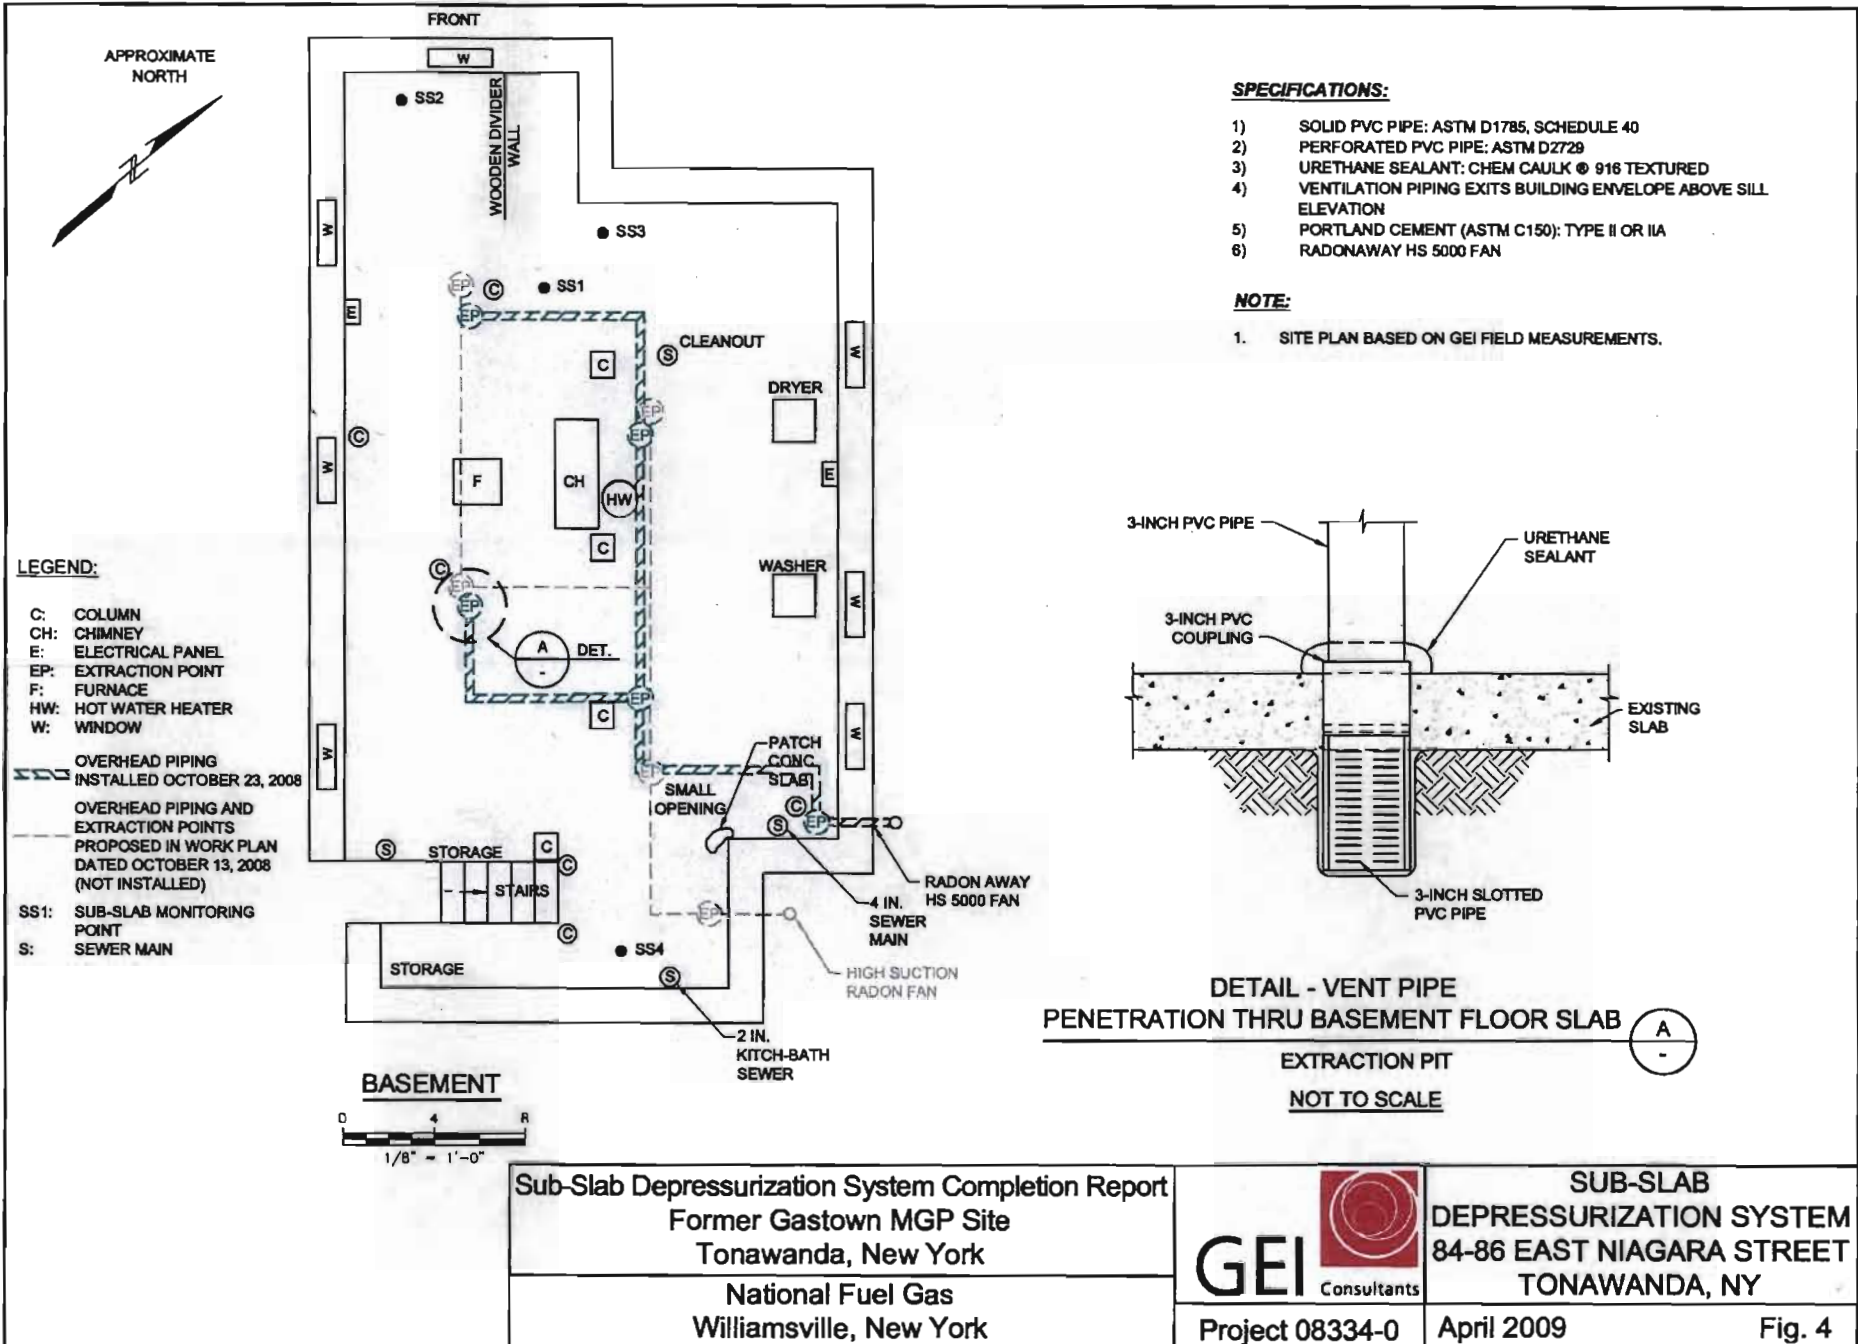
DETAIL - VENT PIPE PENETRATION THRU BASEMENT FLOOR SLAB
